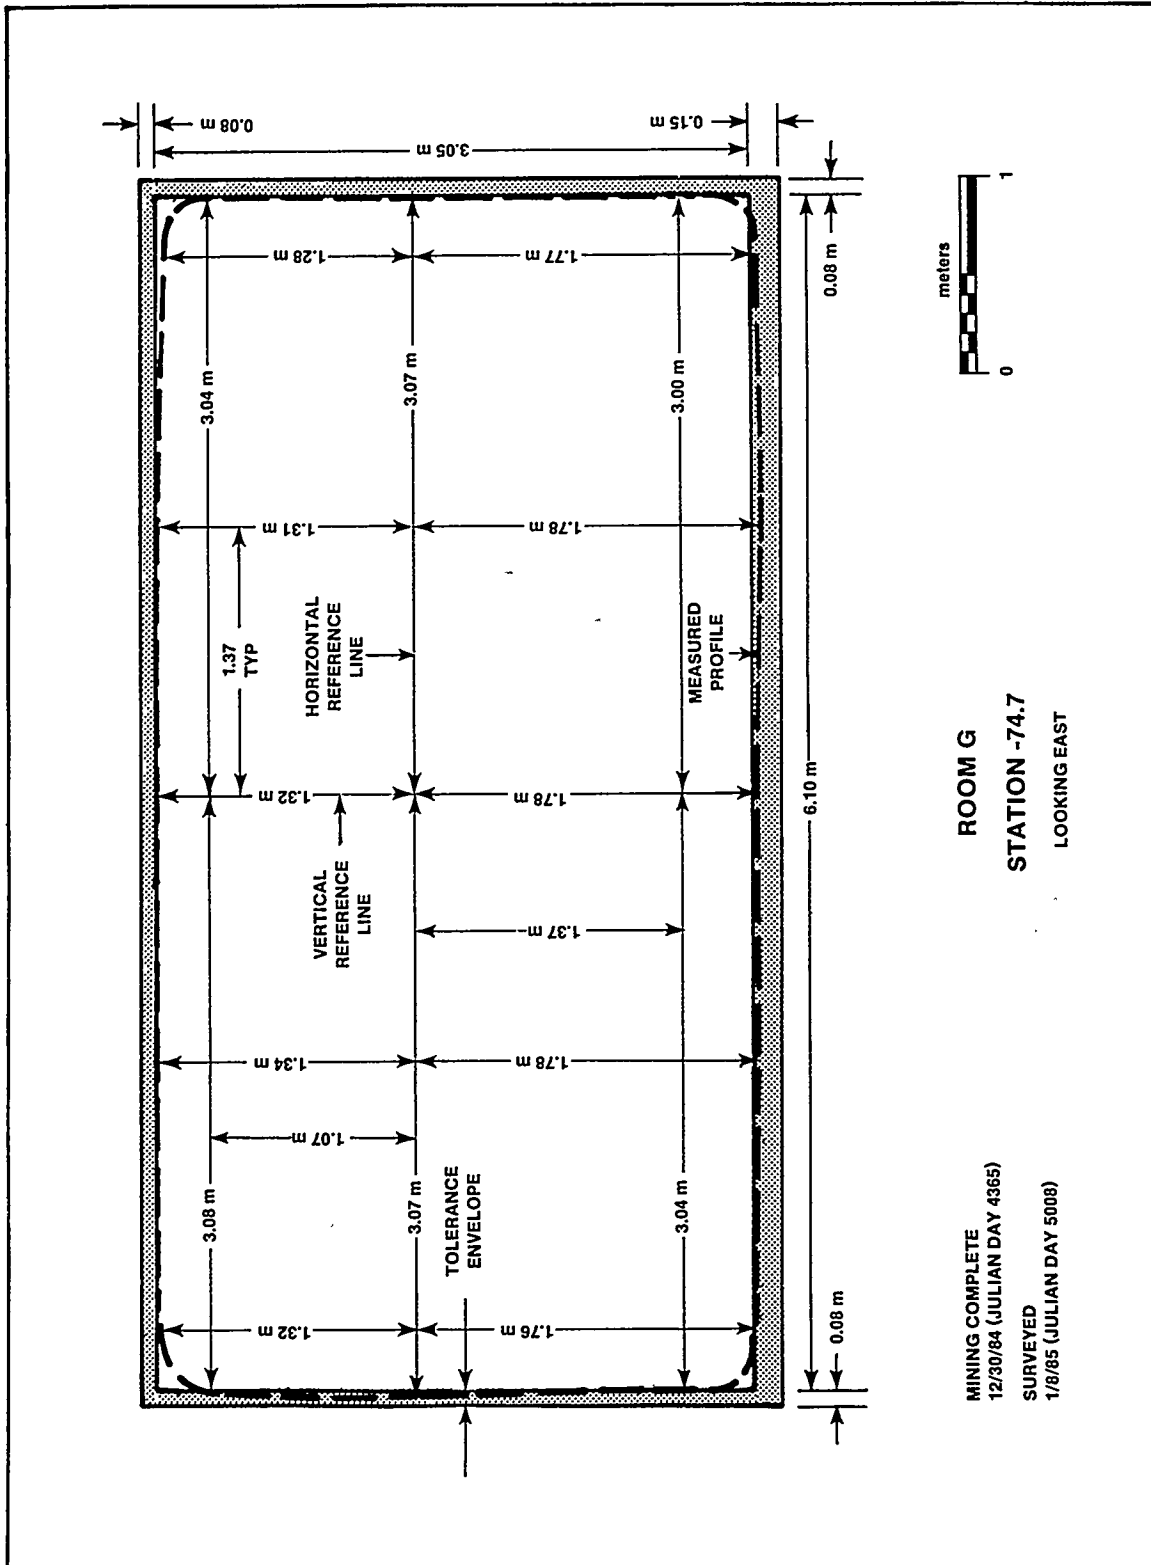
As-Built Cross Section of Station -74.7 m, Room G
